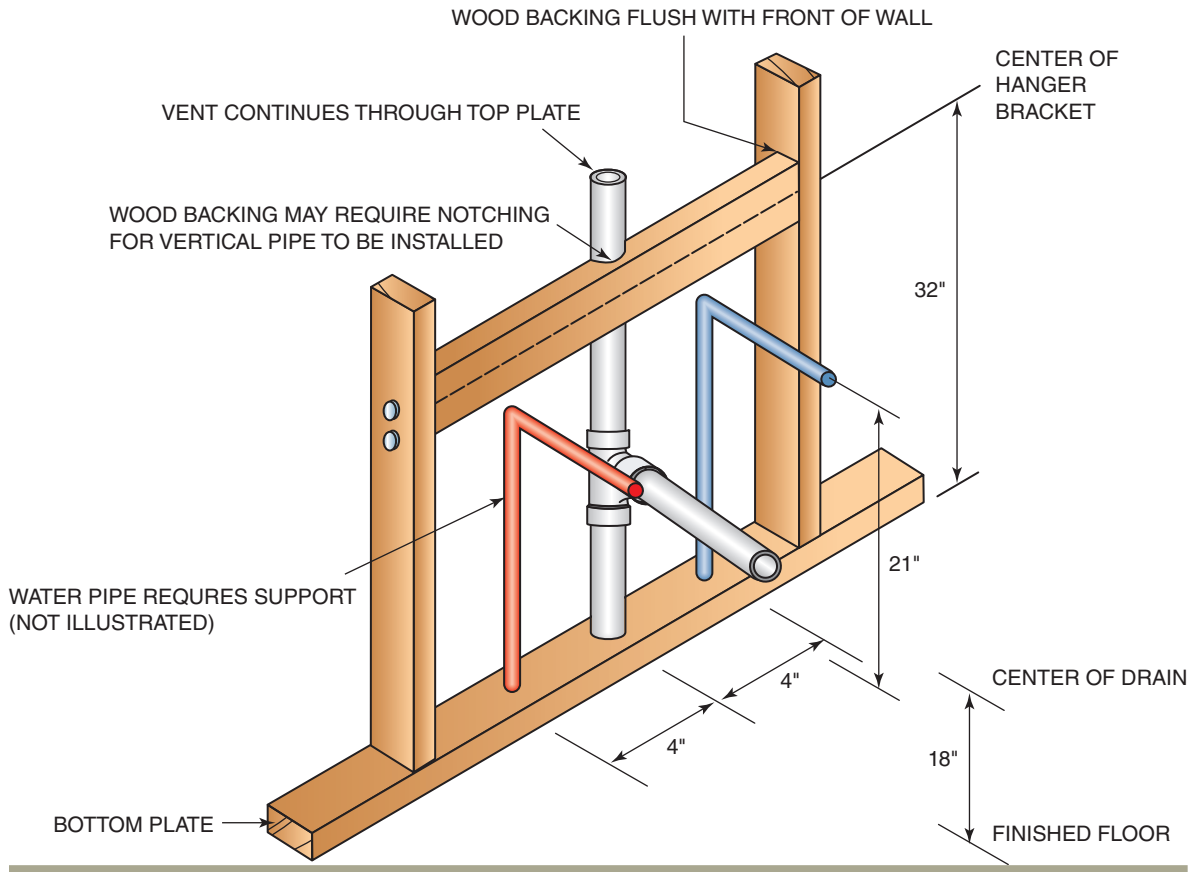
A wall-hung lavatory rough-in has a drain, hot and cold water piping, and wood backing installed in a wall.
